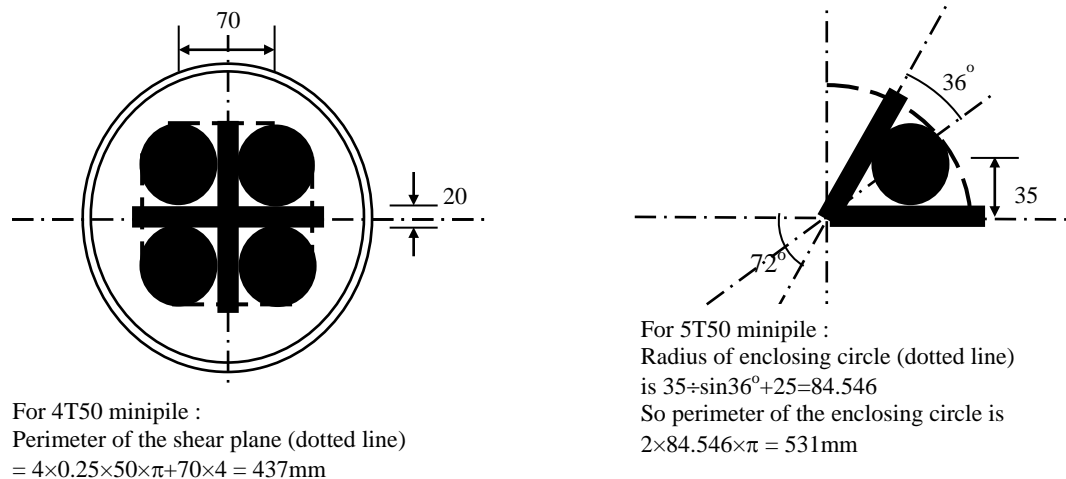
Shear Plane for Checking Bond Stress between Steel Bars and Grout for 4T50 and 5T50 Mini-pile
